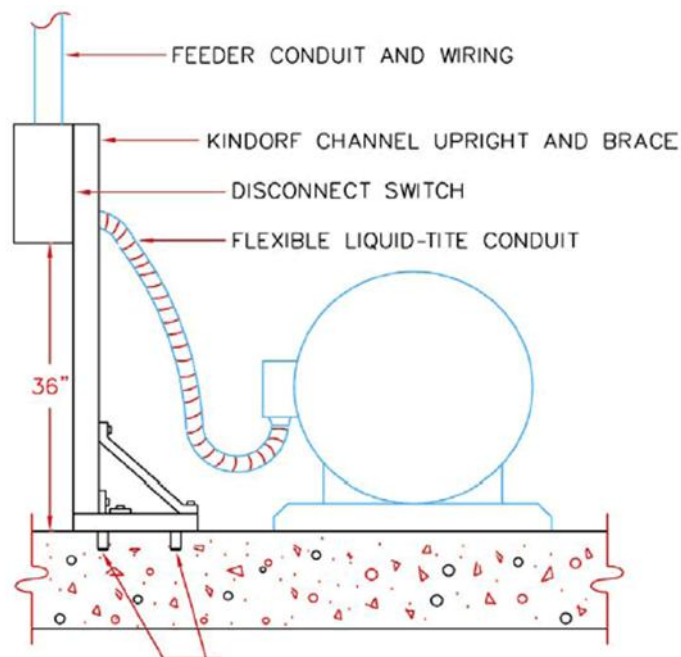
(Sample Picture) Flexible conduit terminations at Junction Box
